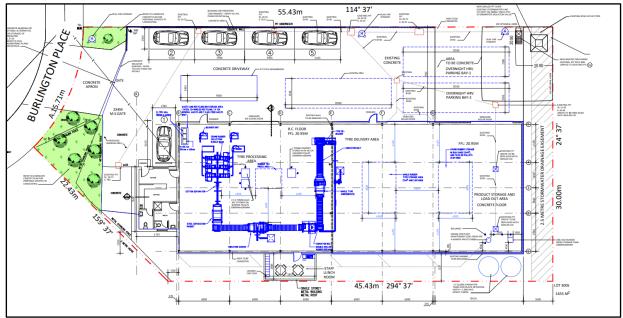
Proposed site plan for Tyre Recycling Facility. The proposal will involve alterations to the existing shed to create a larger fully enclosed industrial shed and staff breakroom
